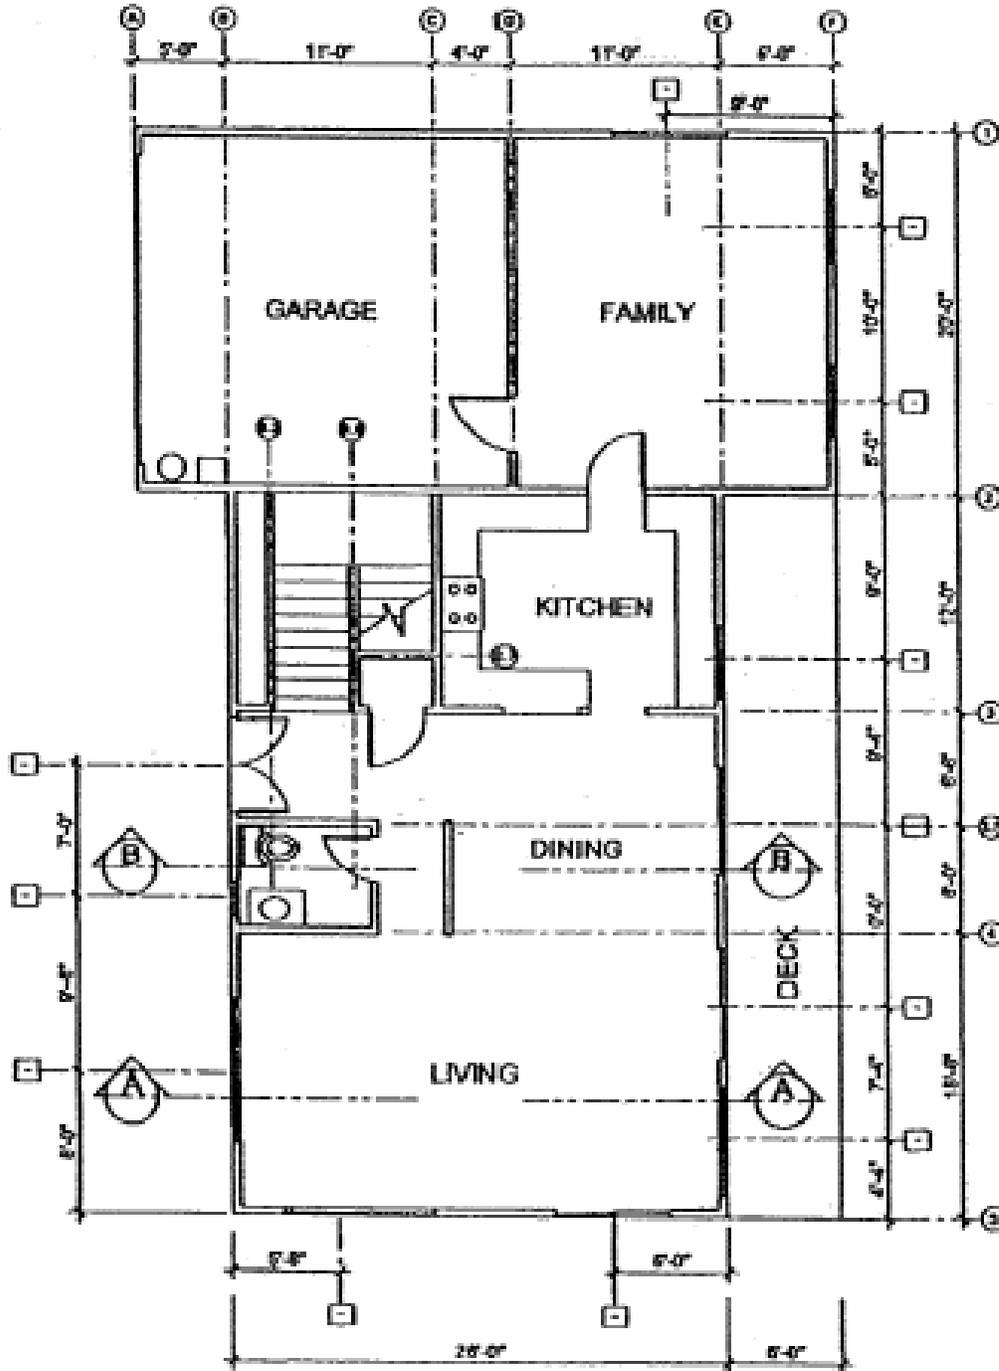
Index building 4 first-floor plan (sheet A1, left)
